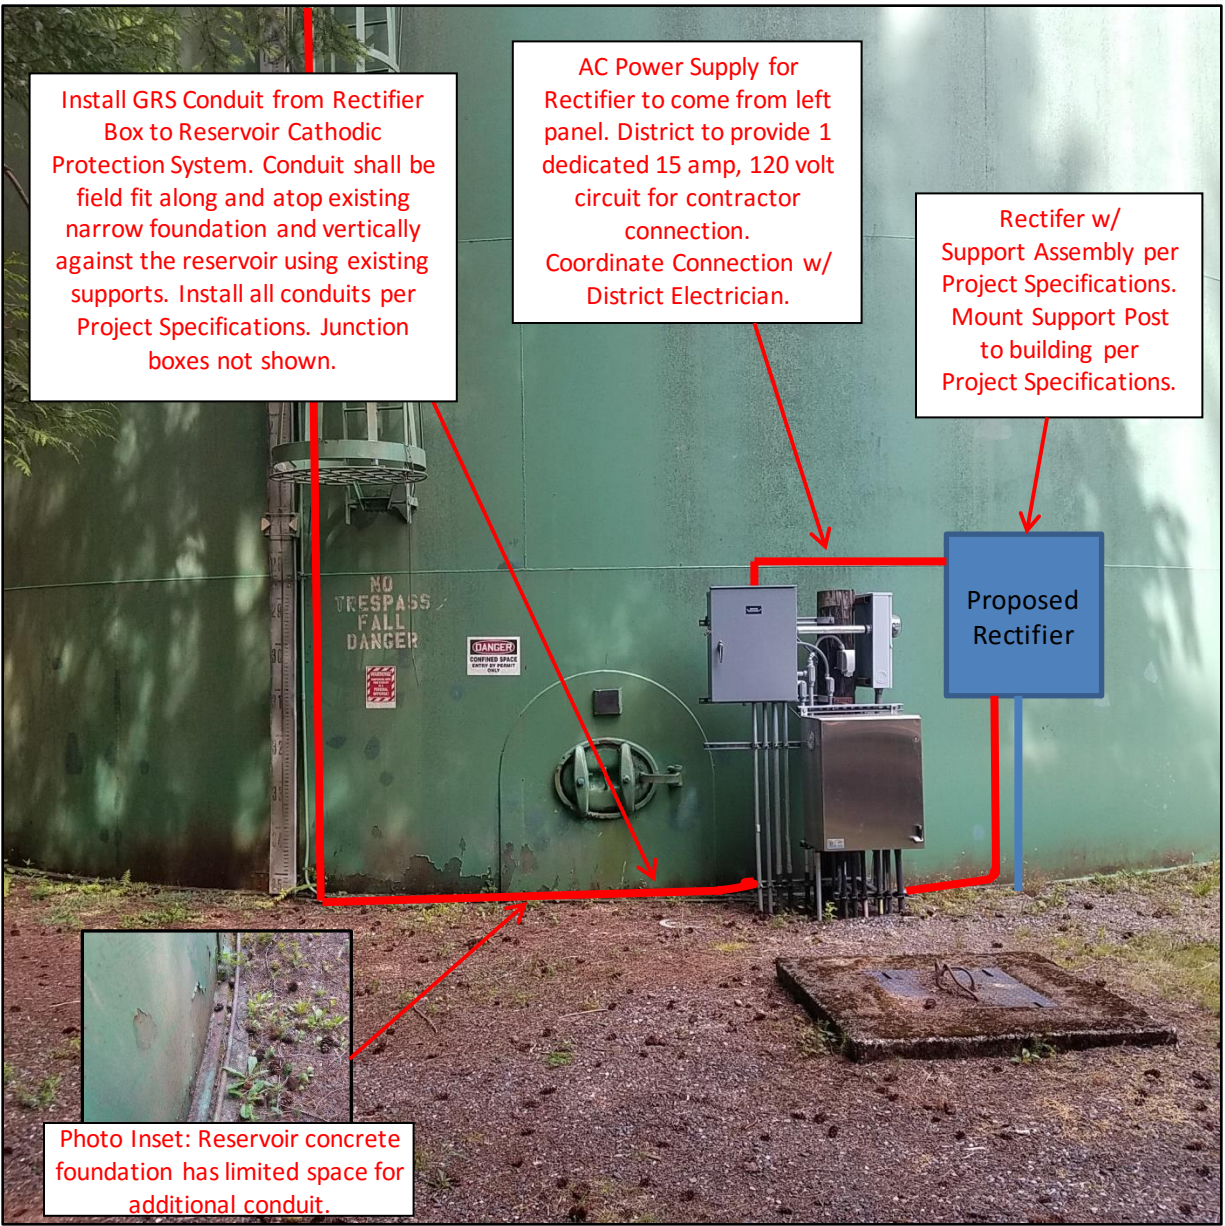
Division 22 Reservoir – Proposed Rectifier and Conduit Locations
